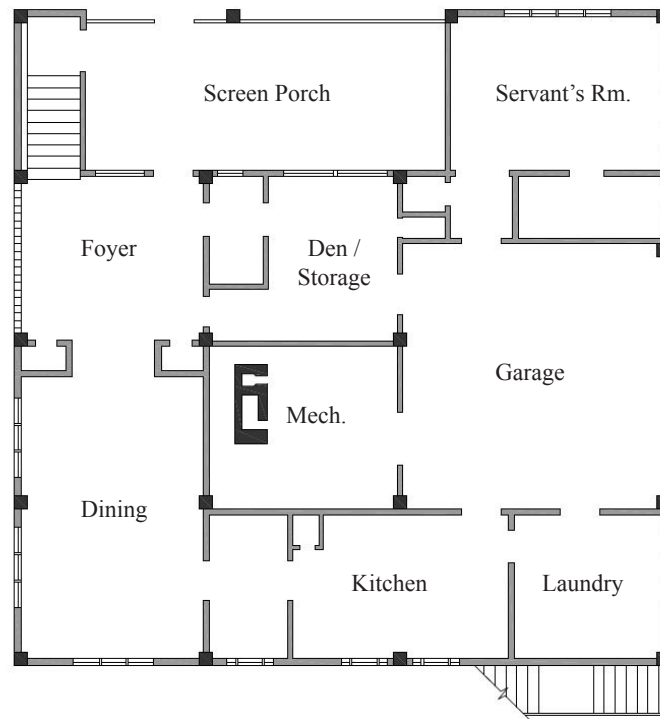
Second design of the Panama House, Ground Floor Plan. Plan followed by Quarters S and T. Drawing by author based off plans from RDA.
